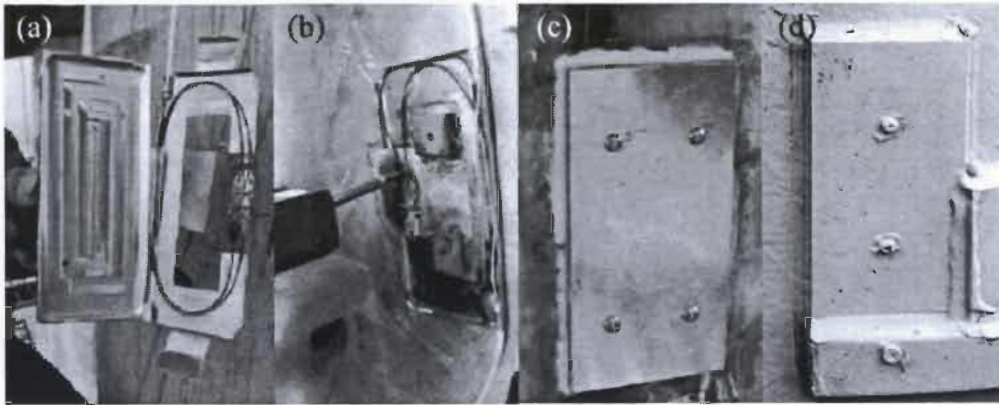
(a) FBG in stainless steel case, (b) spot-weld of FBG sensor on to a metal structure, (c) encapsulated FBG sensor with water proved sealing and (d) FBG sensor painted for anti-corrosion.
